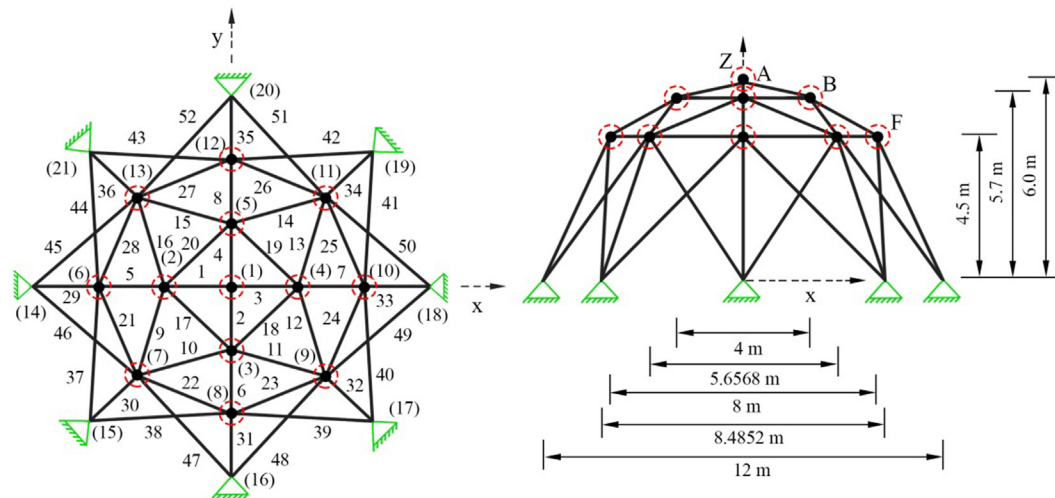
Initial layout of the 52-bar dome-like truss: (a) top view, (b) side view.
